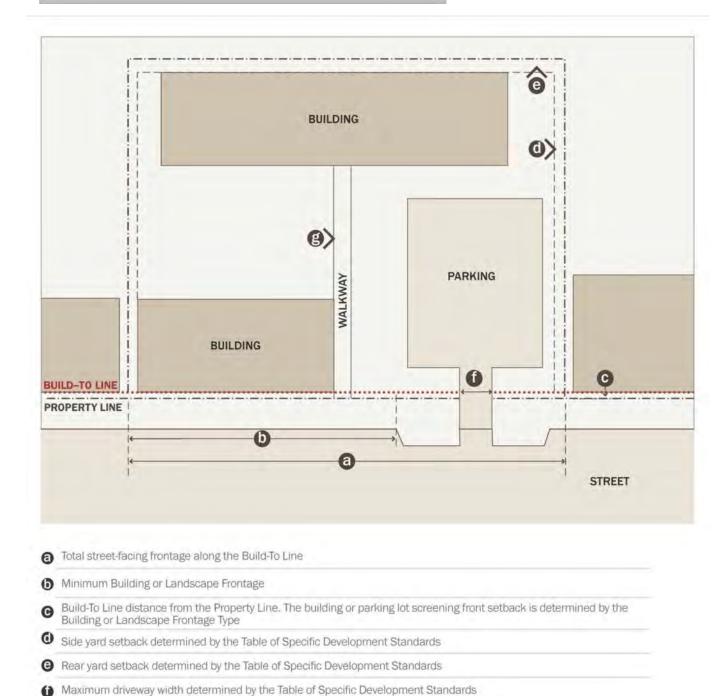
Building Siting for Buildings at the Rear of the Lot
